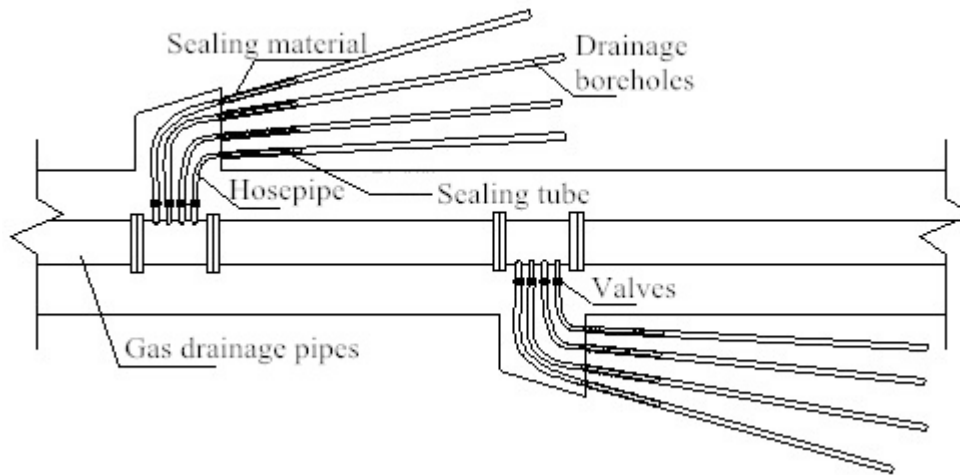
Connection method between the gas drainage boreholes and pipes
